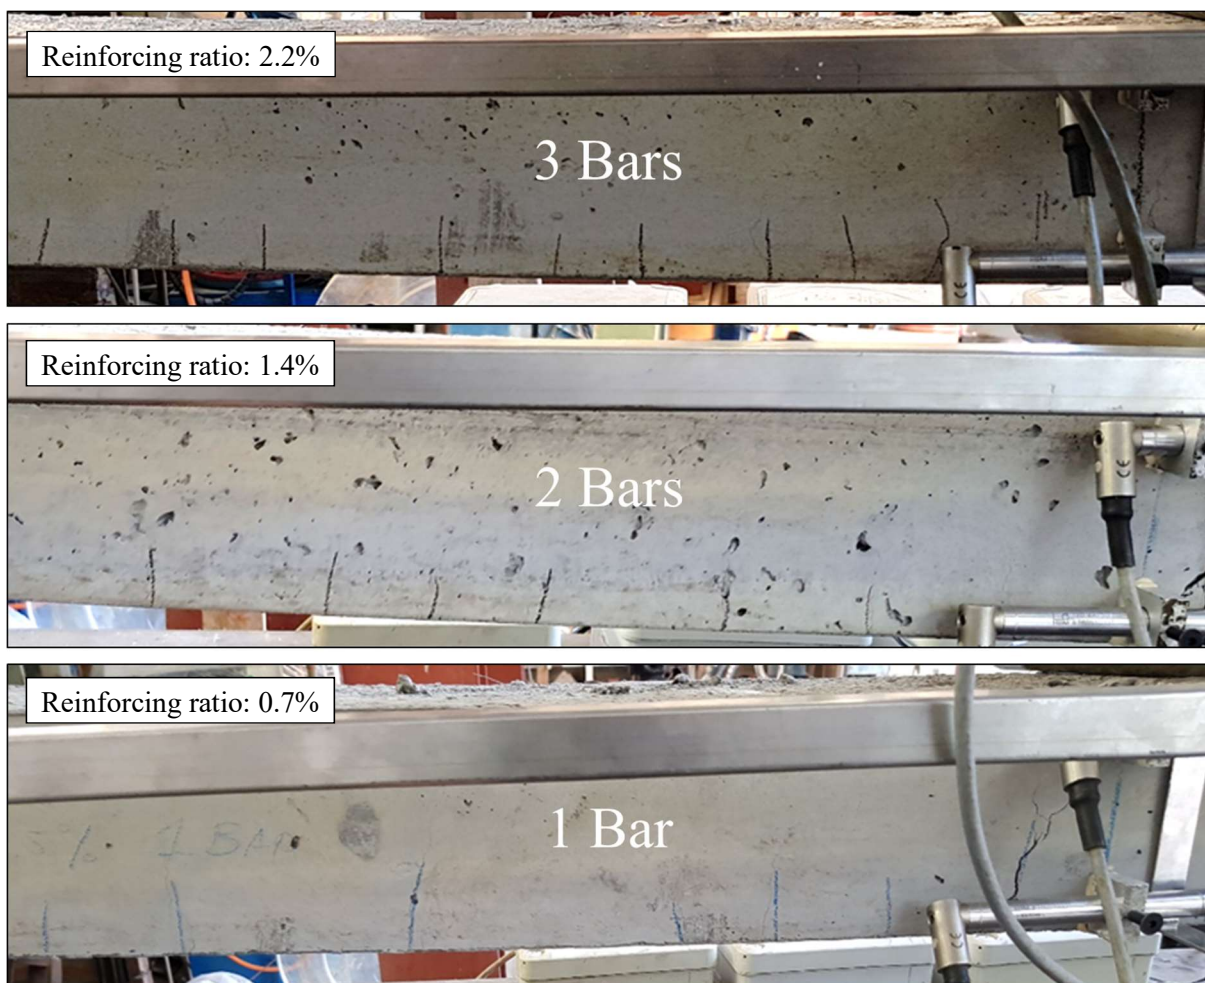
Crack spacing for 3 bars, 2 bars and 1 bar
